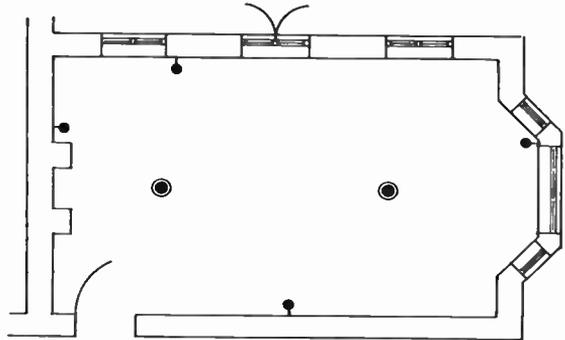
SCHEME FOR DRAWING-ROOM.
